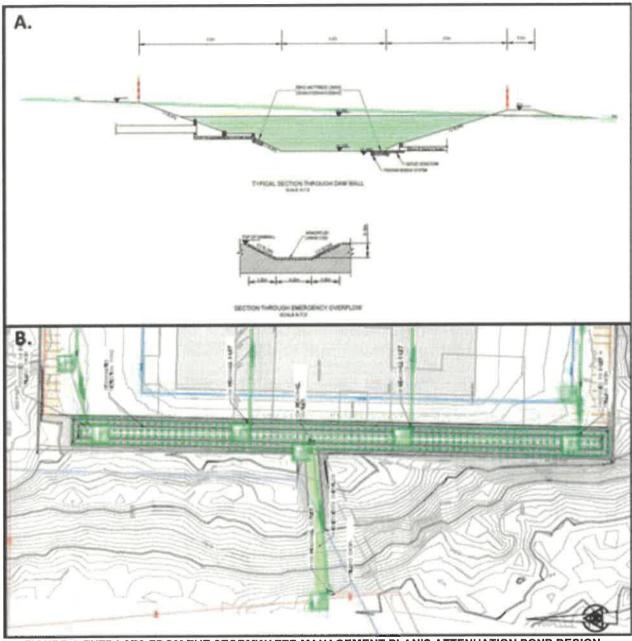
EXTRACTS FROM THE STORMWATER MANAGEMENT PLAN'S ATTENUATION POND DESIGN, SHOWING, A) A CROSS SECTION OF THE POND AND B) A MAP OF ITS LOCATION AGAINST THE SITE'S WESTERN BOUNDARY (KLS CONSULTING ENGINEERS (2022)).
